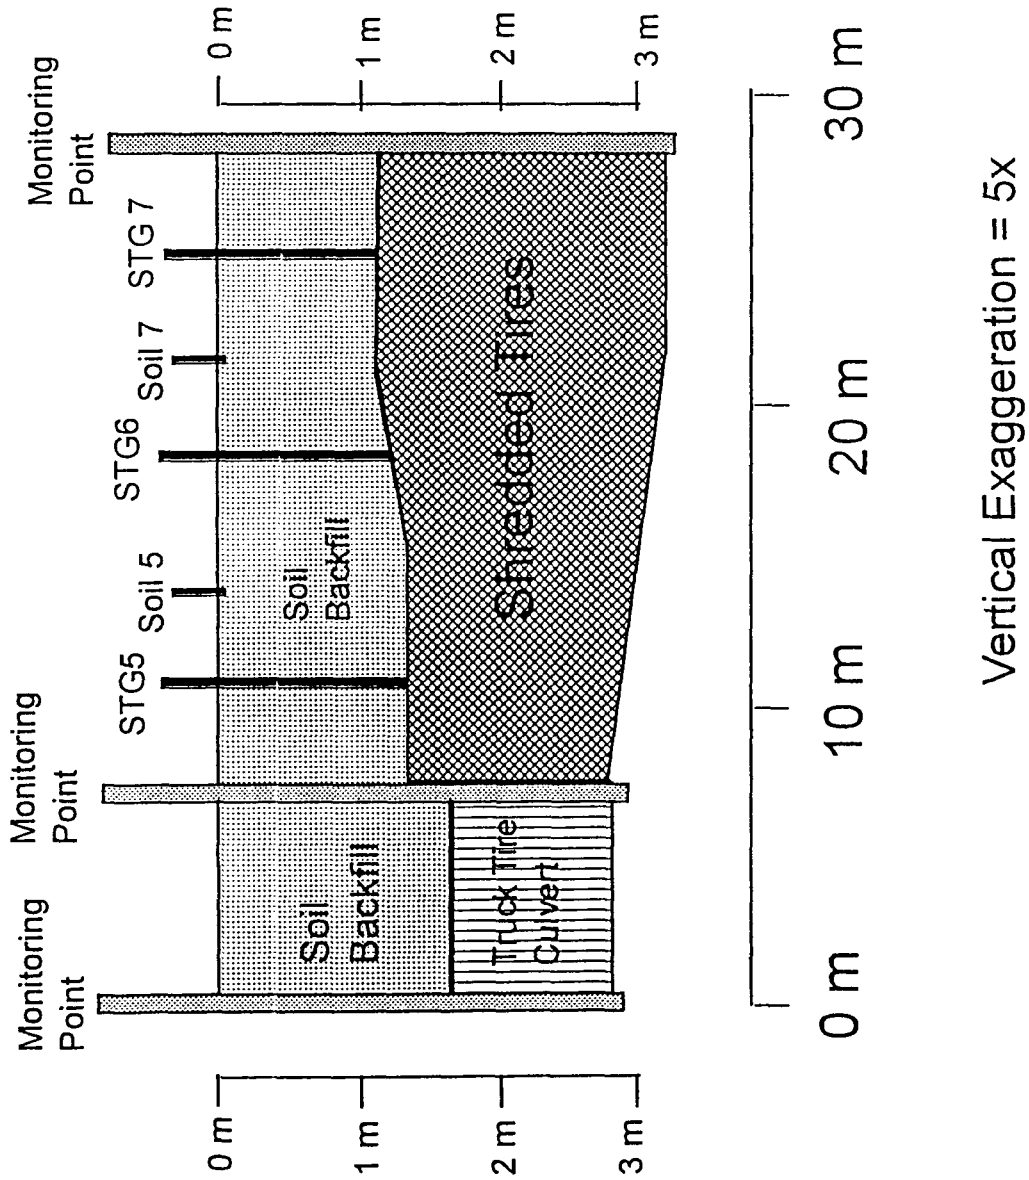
Longitudinal cross section of shredded tire horizontal drain
